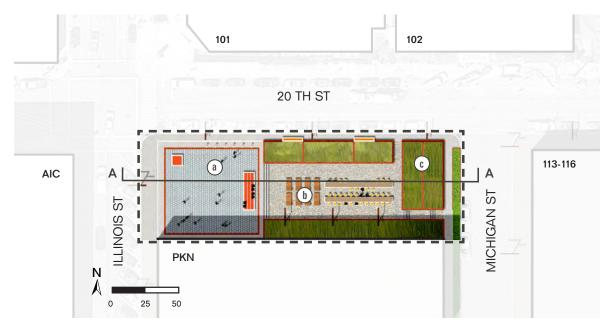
Illustrative 20th Street Plaza Plan
